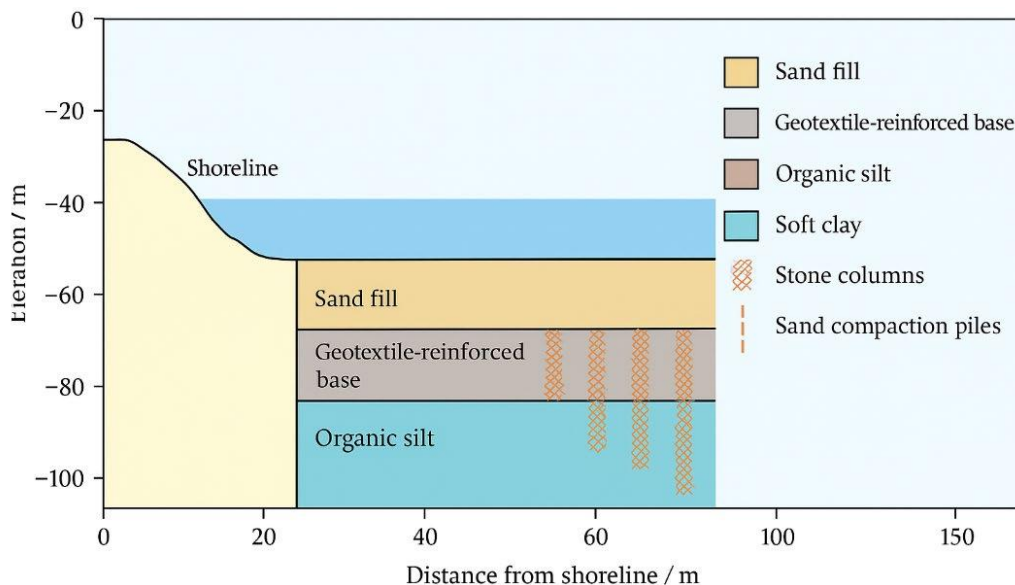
Geotechnical cross-sectional profile of the proposed lotus-shaped island foundation zone
